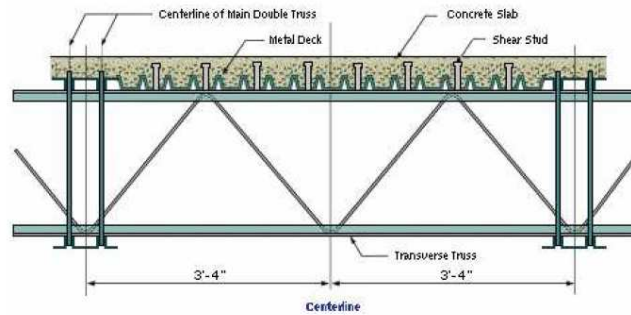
Cross-section through the main double truss, showing transverse truss (shear stud added). FEMA report 2000
